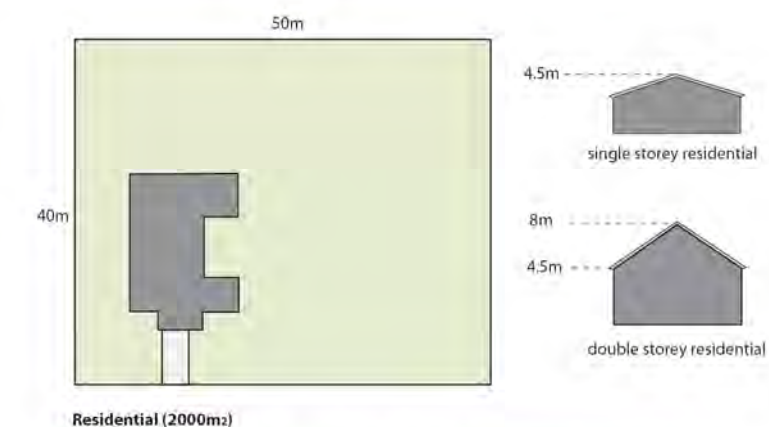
Typical lot layout and building form for 2000m<sup>2</sup> residential lots
